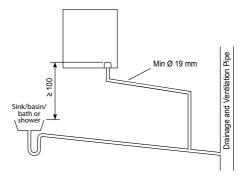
Connection of Condensate Water Drainage Pipe at Indoor Bathroom Drainage Lower Level
